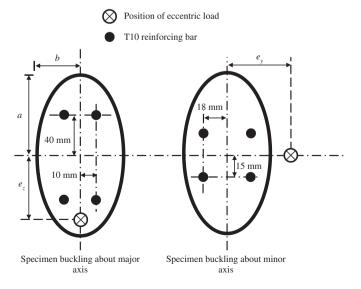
Cross-sectional geometry of CFEHS specimens with reinforcement and eccentric load positions.
